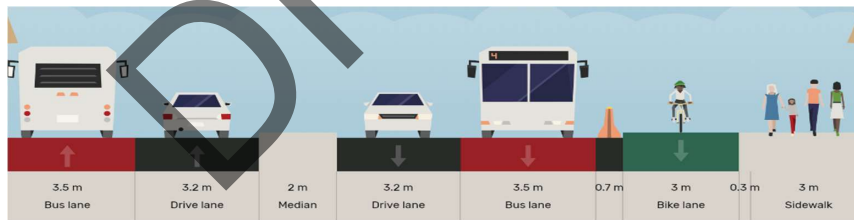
Option 3 – Thorndon Quay Indicative Plan and Cross Section
